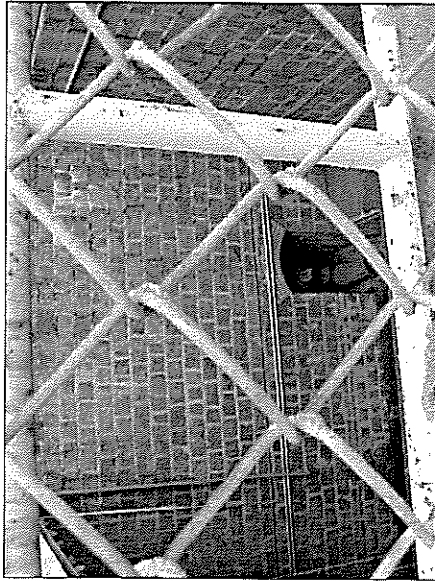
Site 50-80-12-4347, well wall of central pumping station, view to the north
